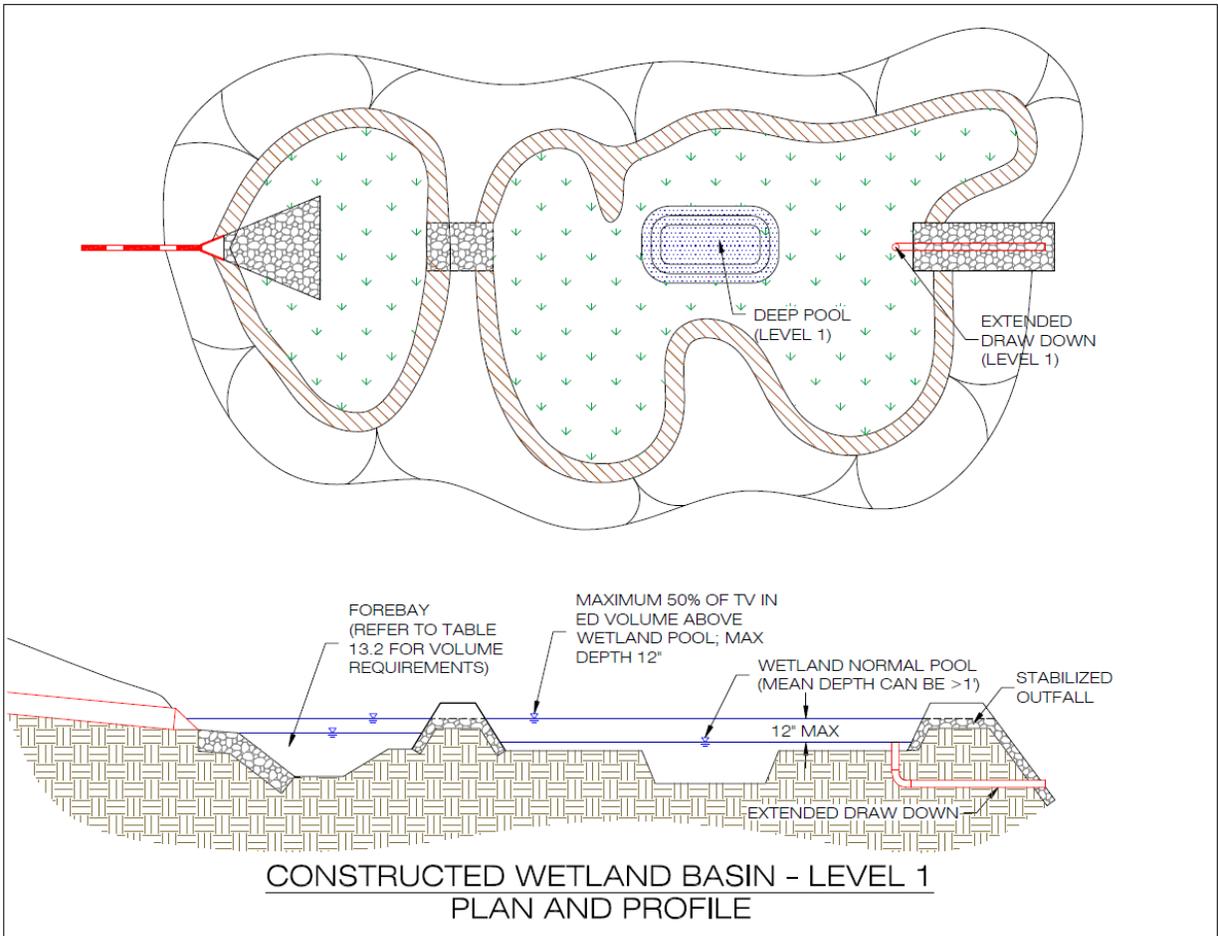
Level 1 Constructed Wetland Plan and Cross Section
